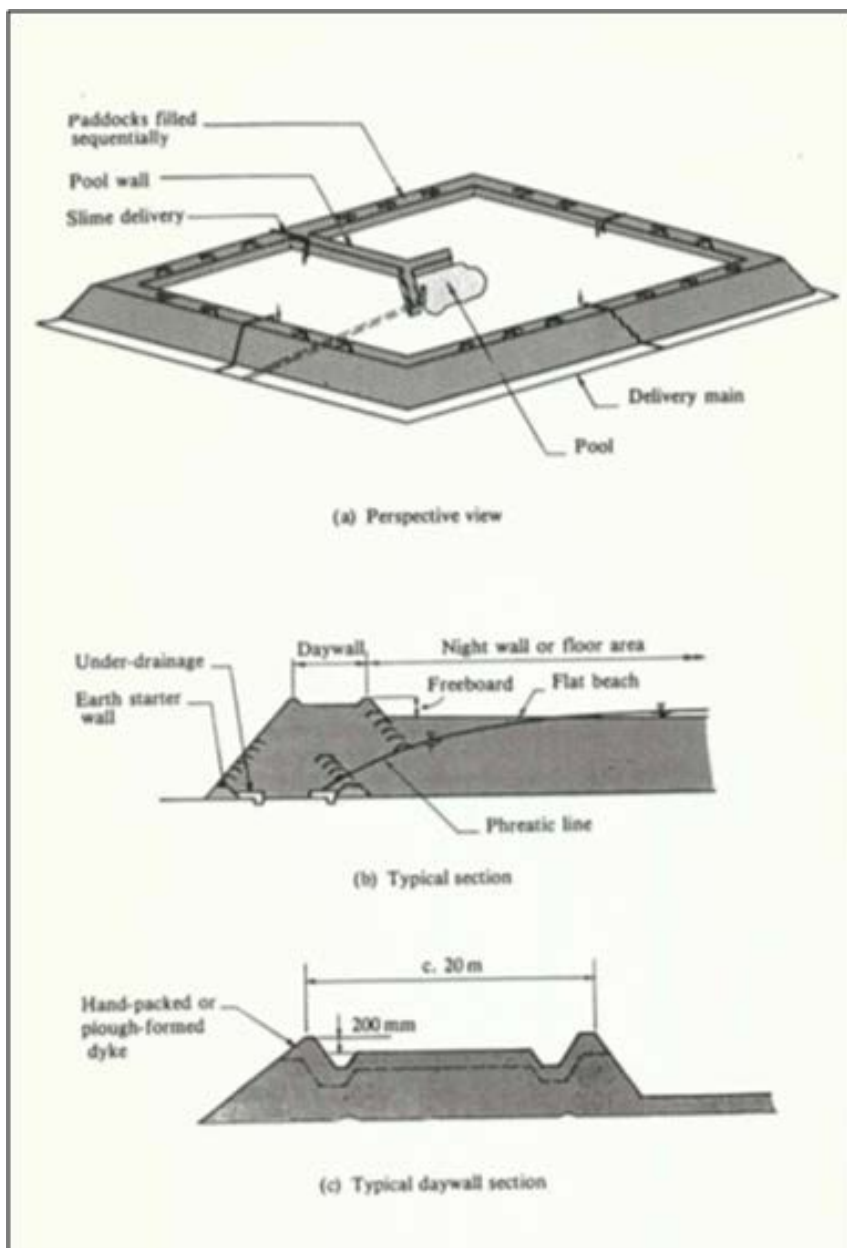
Typical Construction of a Day-Wall Paddock System
